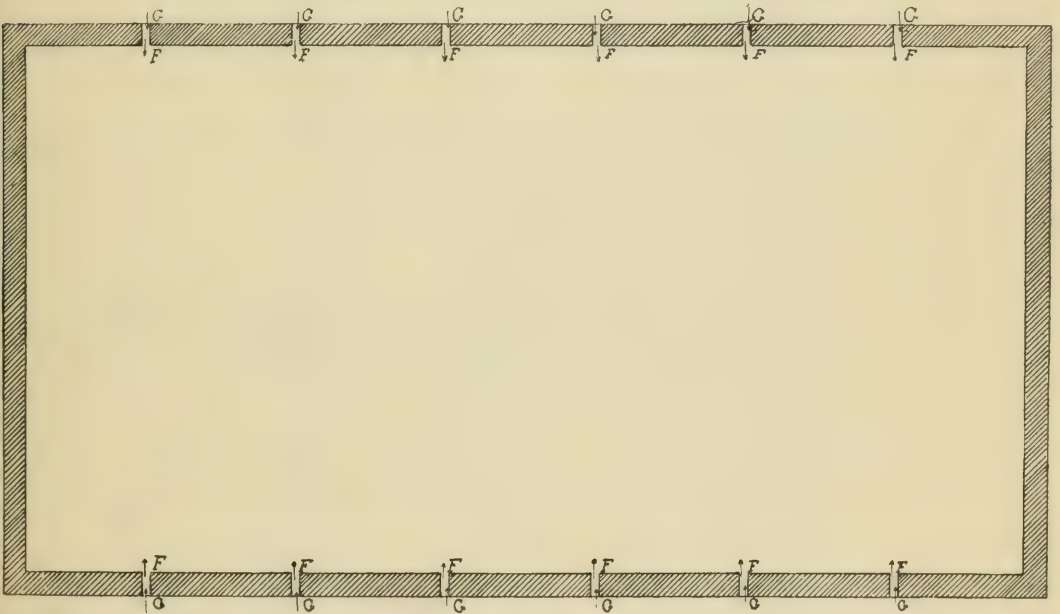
Plan devised by Prof. King, of Wisconsin. Horizontal projection showing fresh air inlets.
